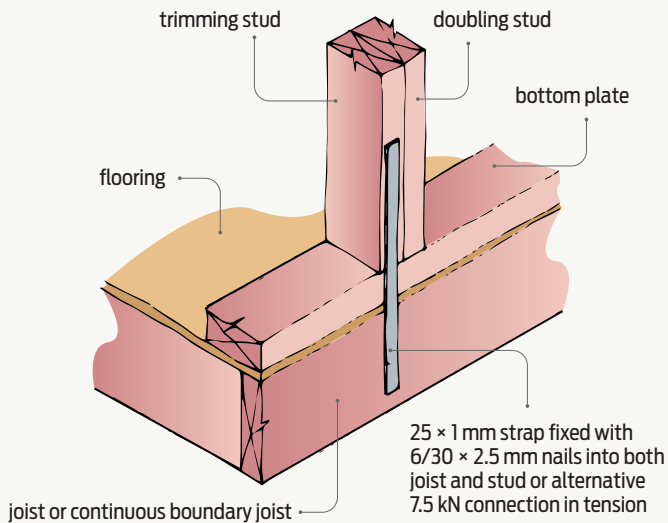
Fixing trimming stud and bottom plate to timber floor framing.
